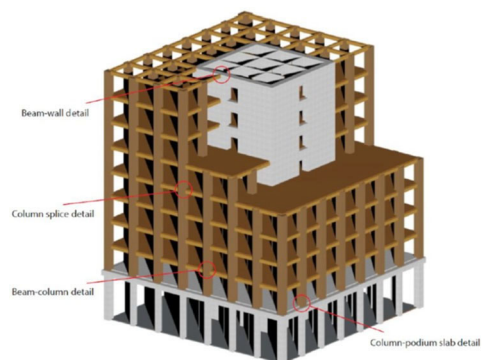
Main geometry of the building with concrete core and timber columns and floors.
